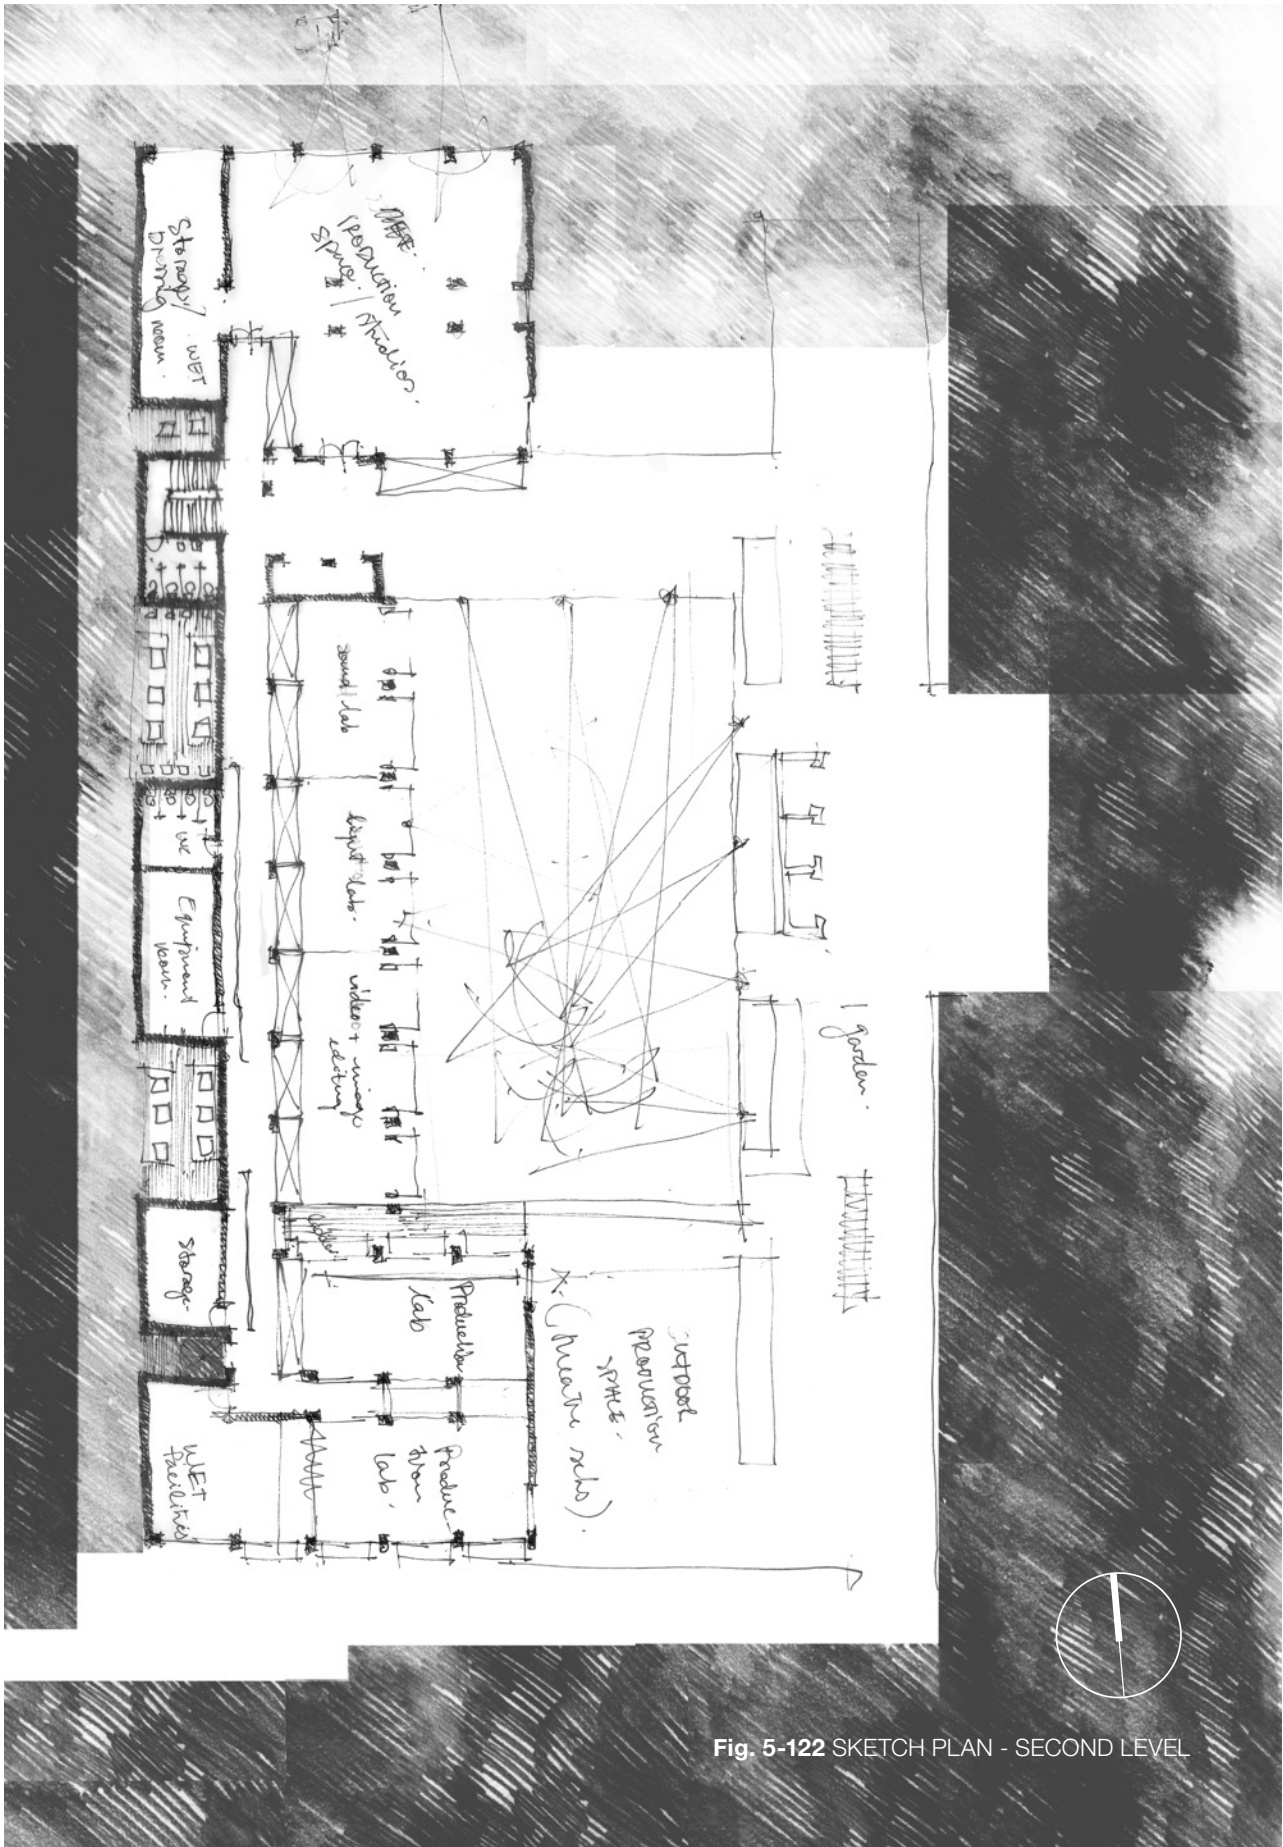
SKETCH PLAN - SECOND LEVEL
